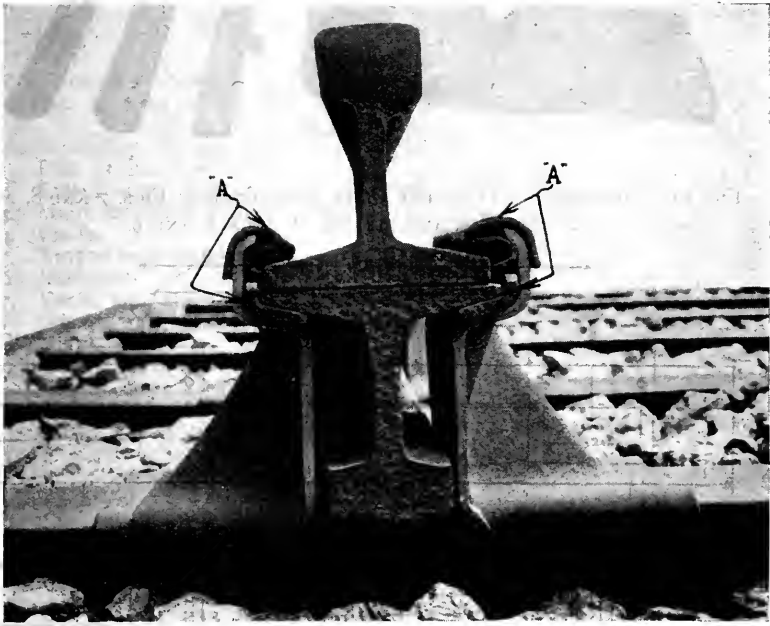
CROSS-SECTION OF THE RUNNING RAIL ADJACENT TO THE NEW DESIGN MORGAN TIE.
